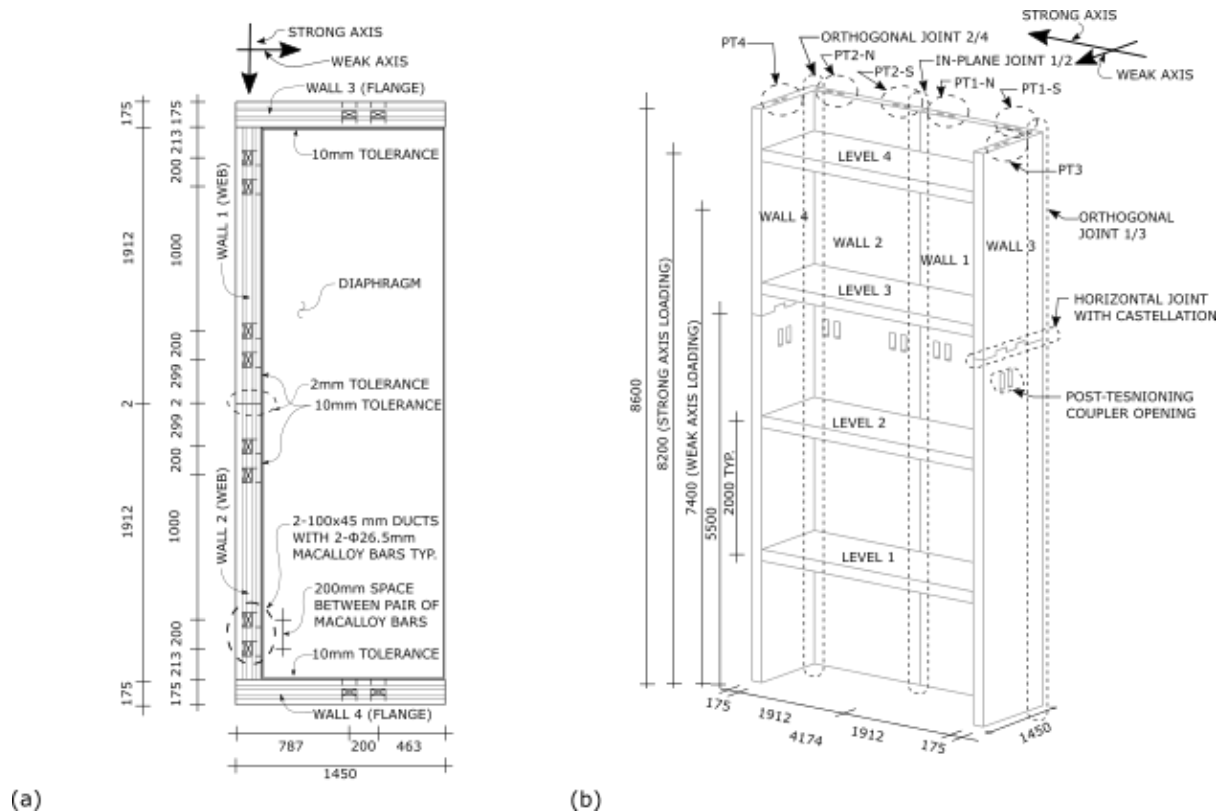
Core-wall experimental design: (a) core-wall plan view arrangement, and (b) core-wall test isometric
